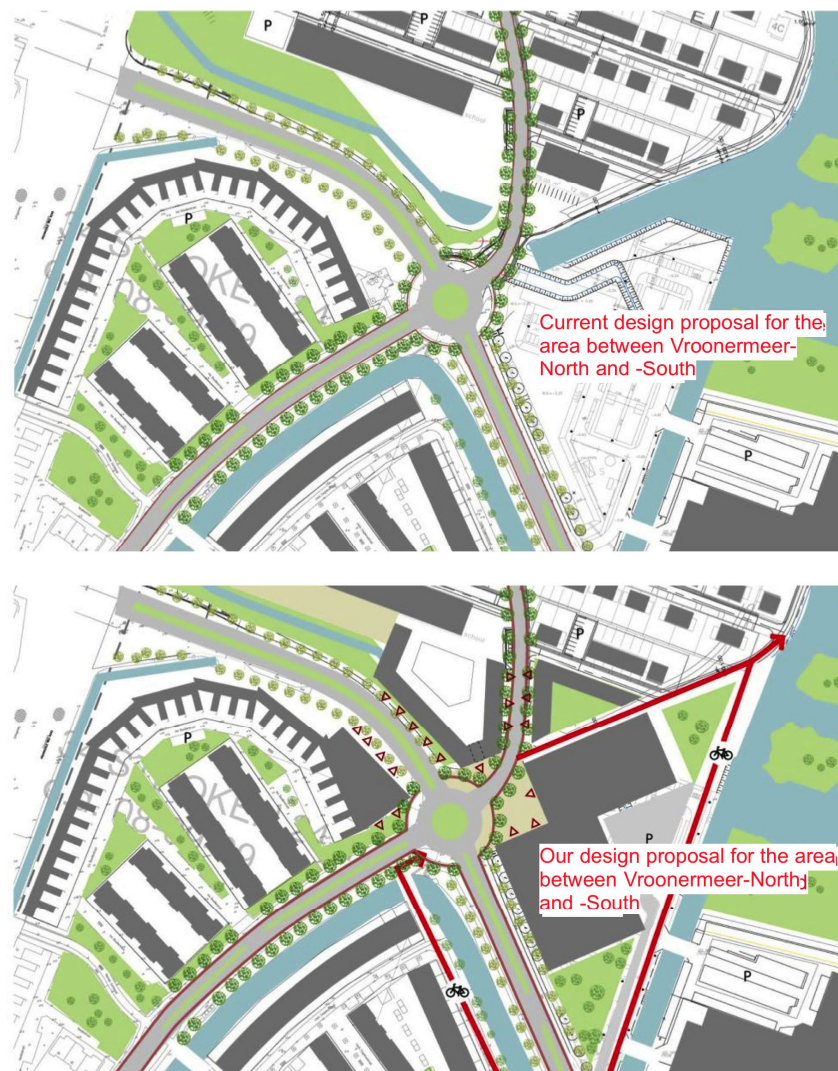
Design proposals for a new local centre for the area between Vroonermeer-North and -South
